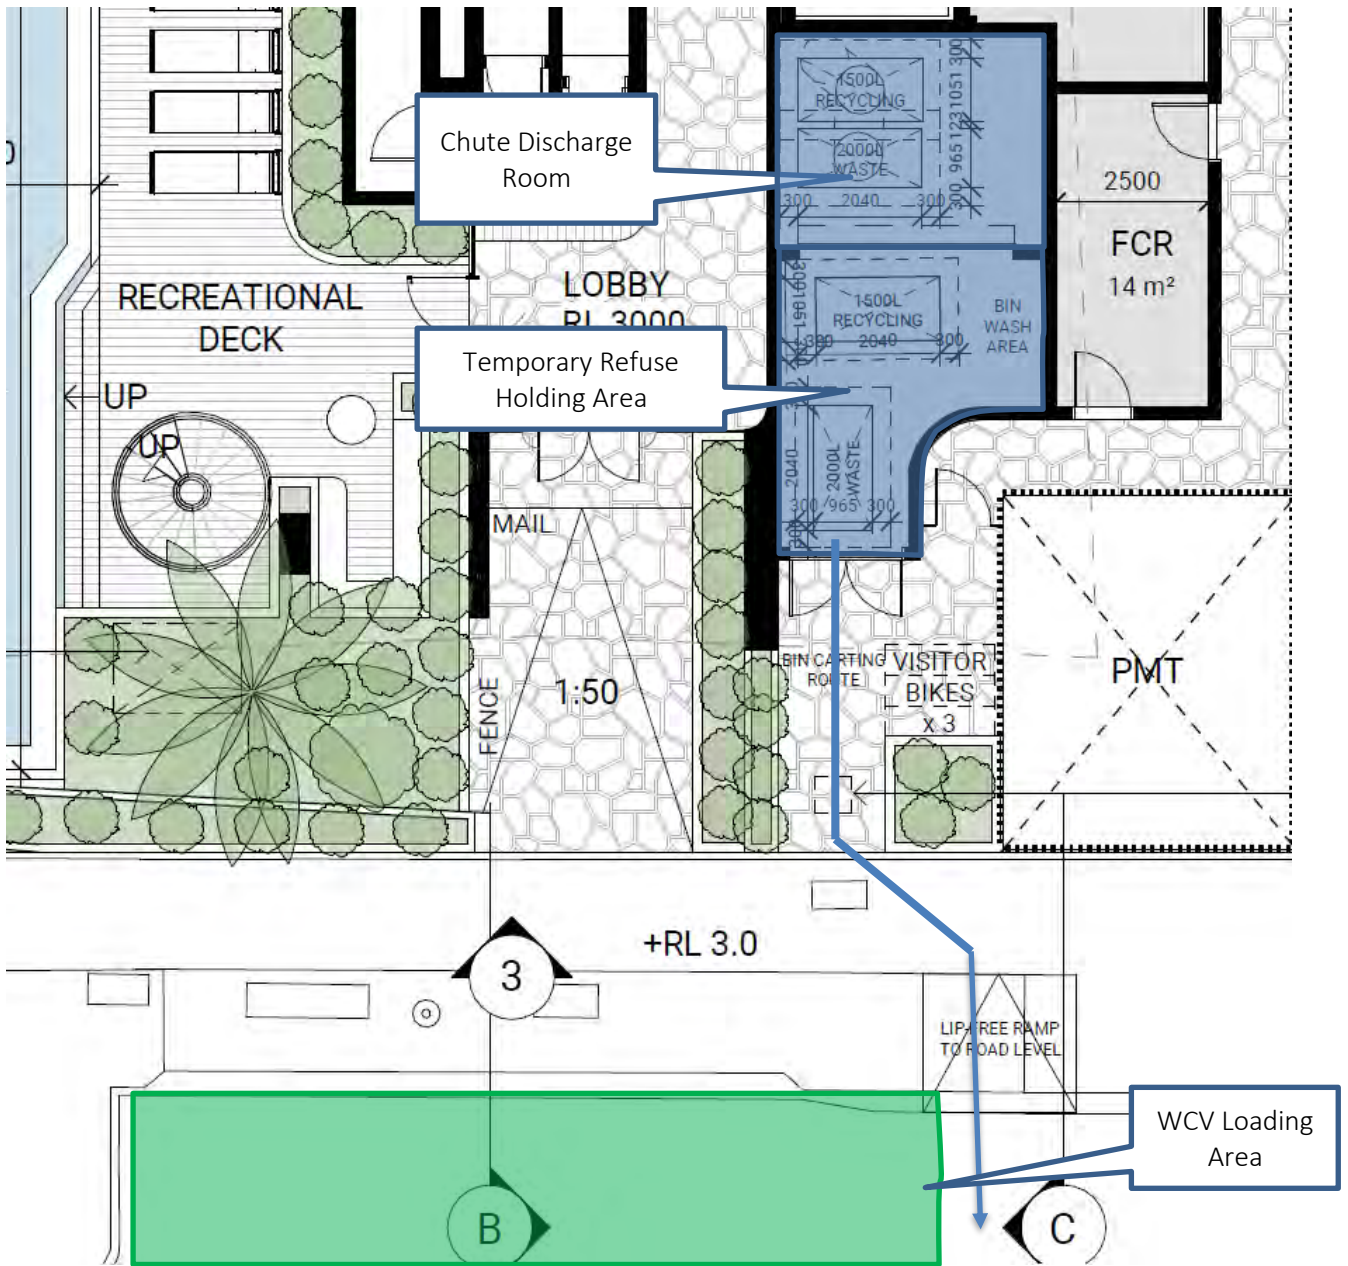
Bin Room and Servicing Area (Source: Plus architecture, DA100 Ground Level Floor Plan, Nov 2022)
